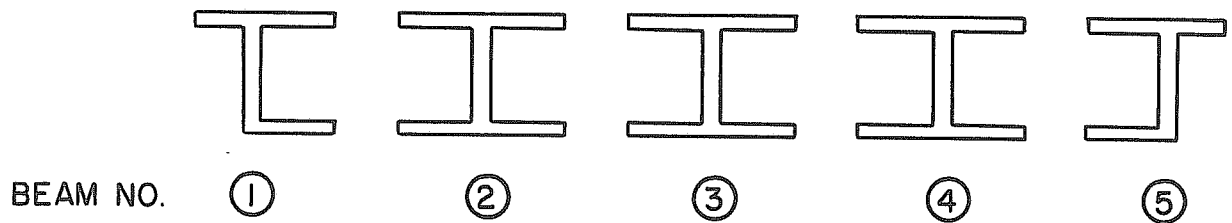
DIVISION OF BOX GIRDER SECTION INTO I BEAMS
